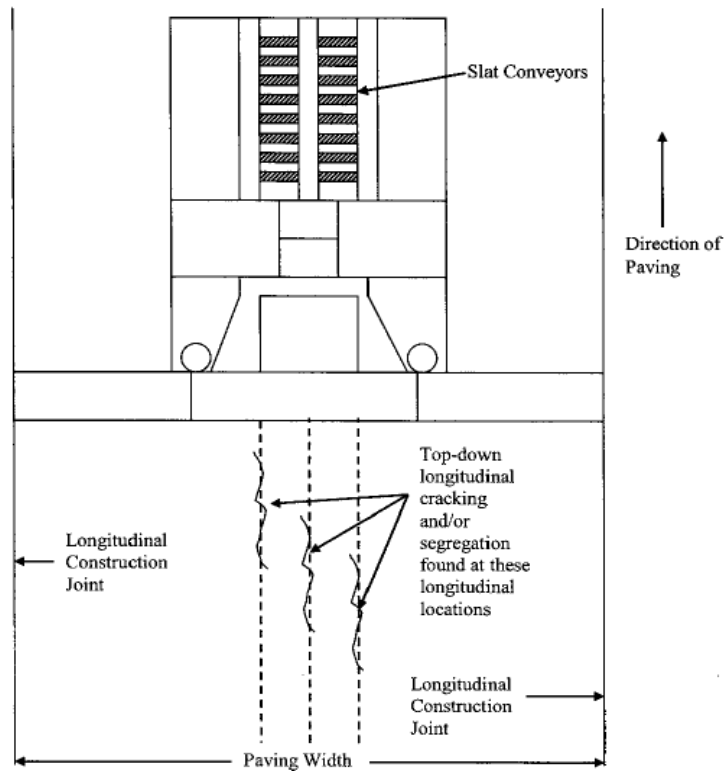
Paver Top View and Associated Cracks (after Harmelink et al. 2008).
